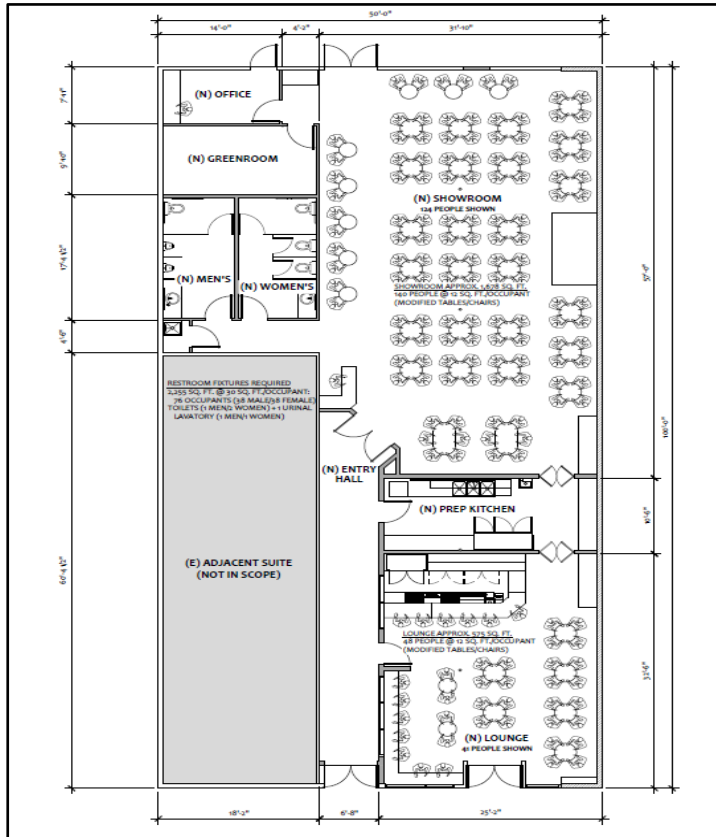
EXISTING APPROVED FLOOR PLAN
